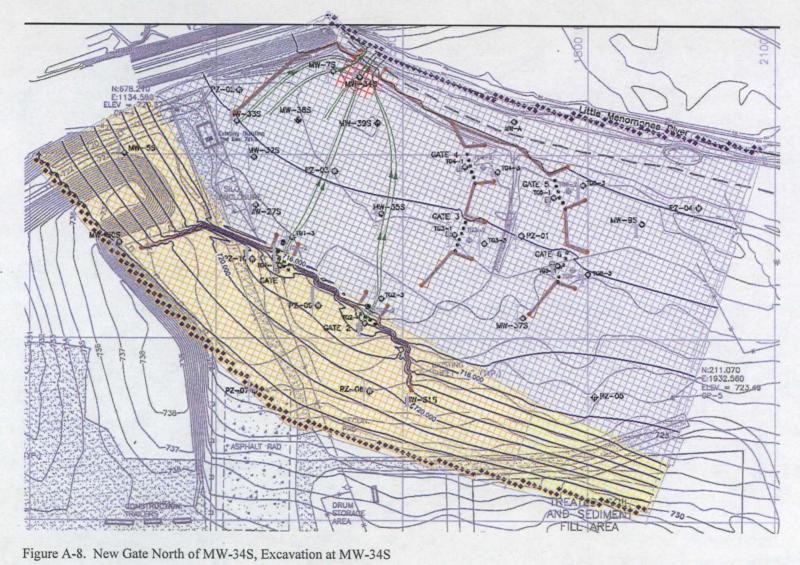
New Gate North of MW-34S, Excavation at MW-34S
